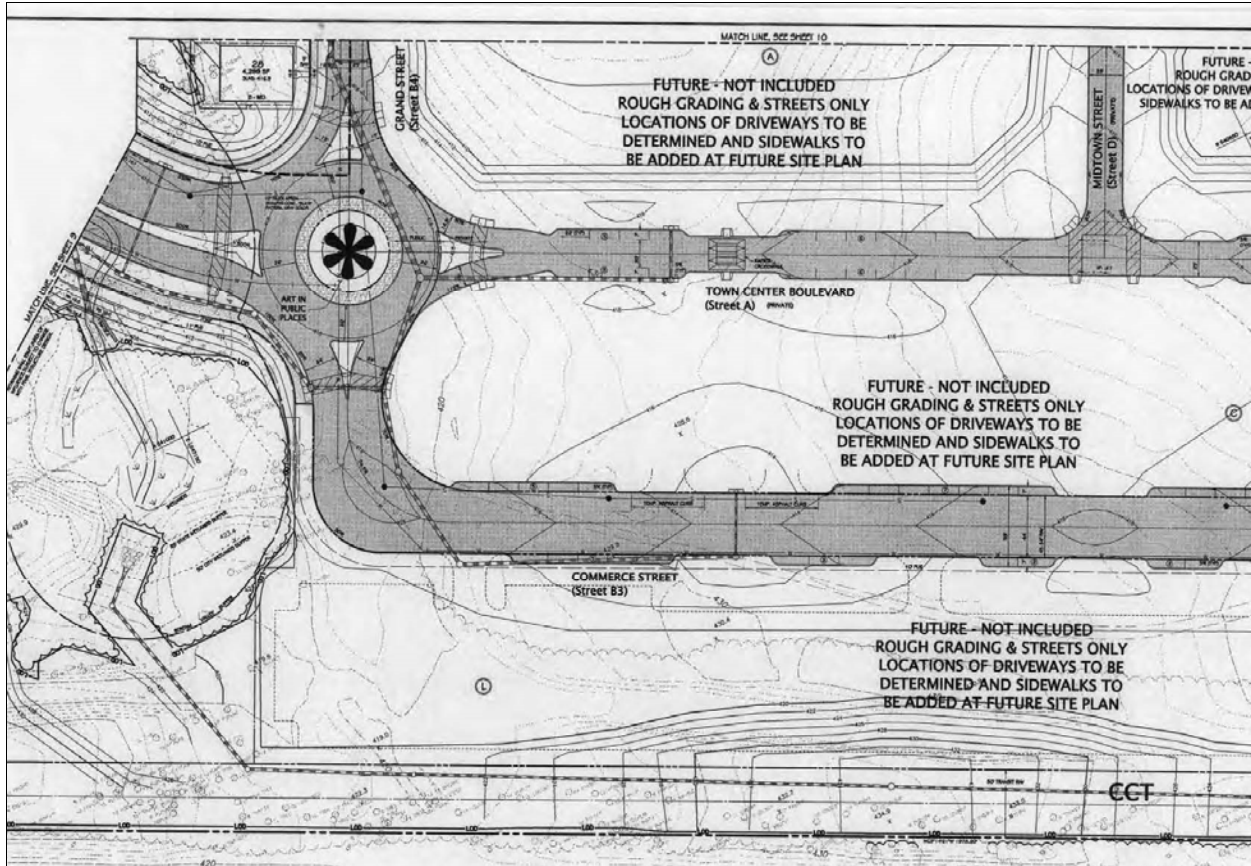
Sheet 21 of approved Site Plan SP 05 0013
